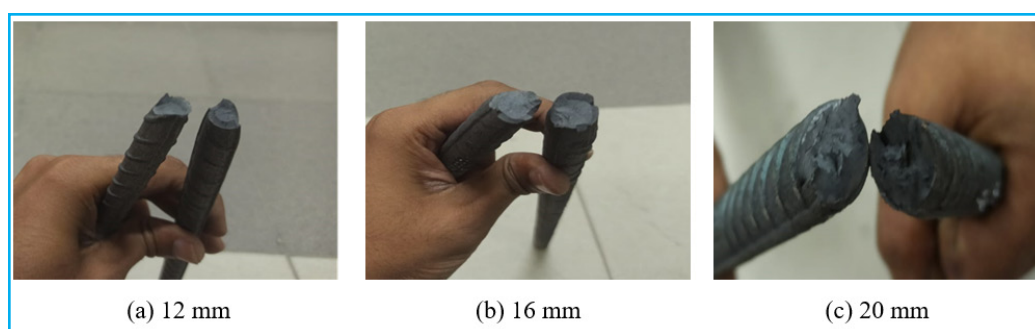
Failure of (a) 12 mm, (b) 16 mm, (c) 20 mm of 72.5 grade rebar
